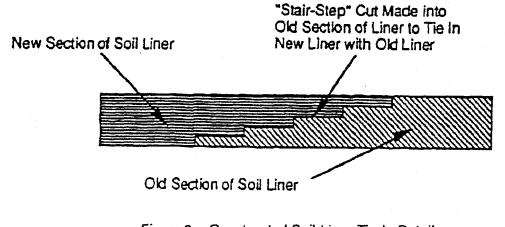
Constructed Soil Liner Tie-In Detail Aducted from EPA 600/R-CU192. September 1900 Technical Quatrica Documents
